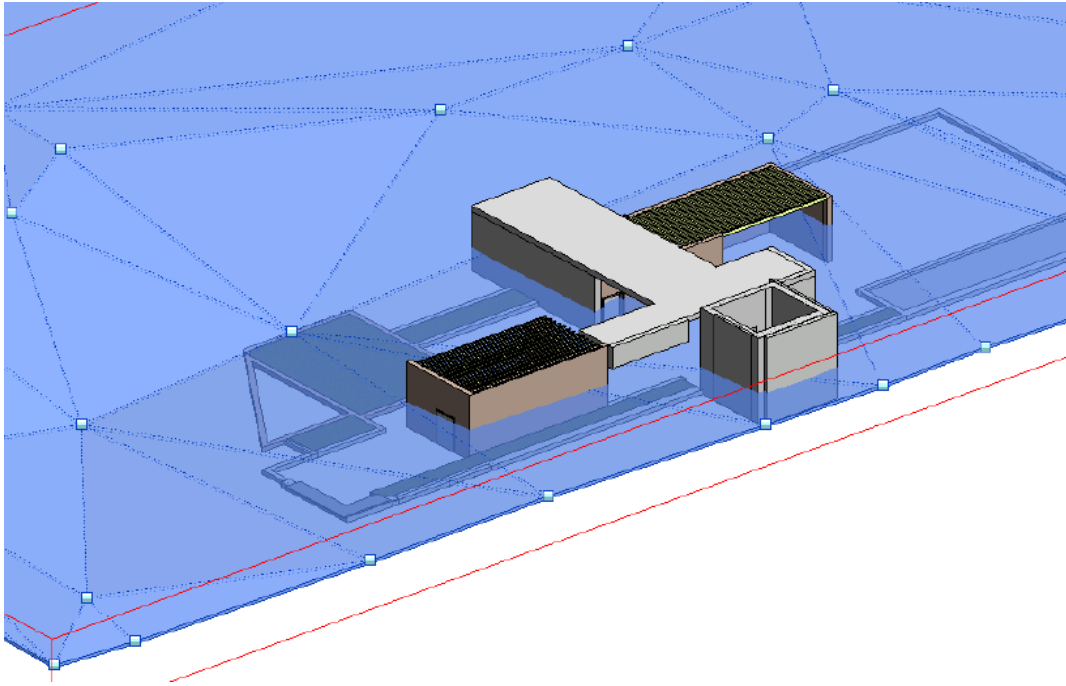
Extract from Cl.4.6 statement, showing parts of Young Street North building that exceed the standard, including the lift overrun, stair overrun and weather awning
